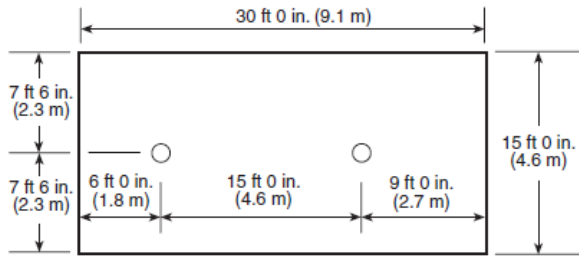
(c) Small Room Provision — Two Sprinklers Centered Between Top and Bottom Walls.
